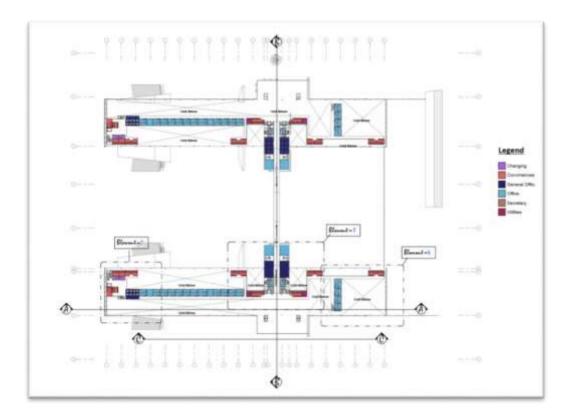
Proposed mezzanine floor plan Source: Researcher's design proposal, (2020)
